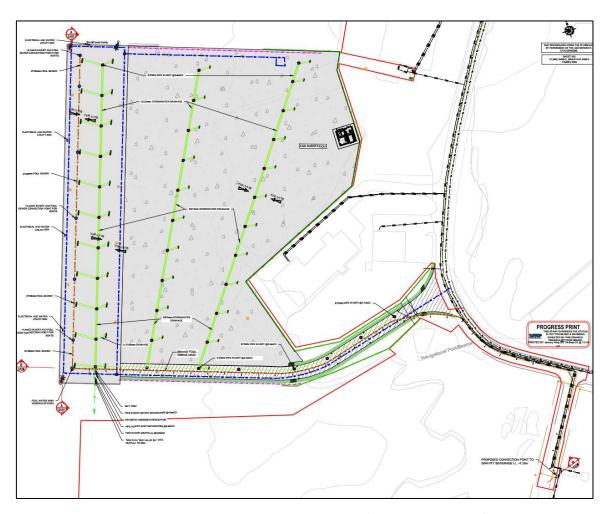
Proposed watermain, stormwater and foul water discharge facilities
